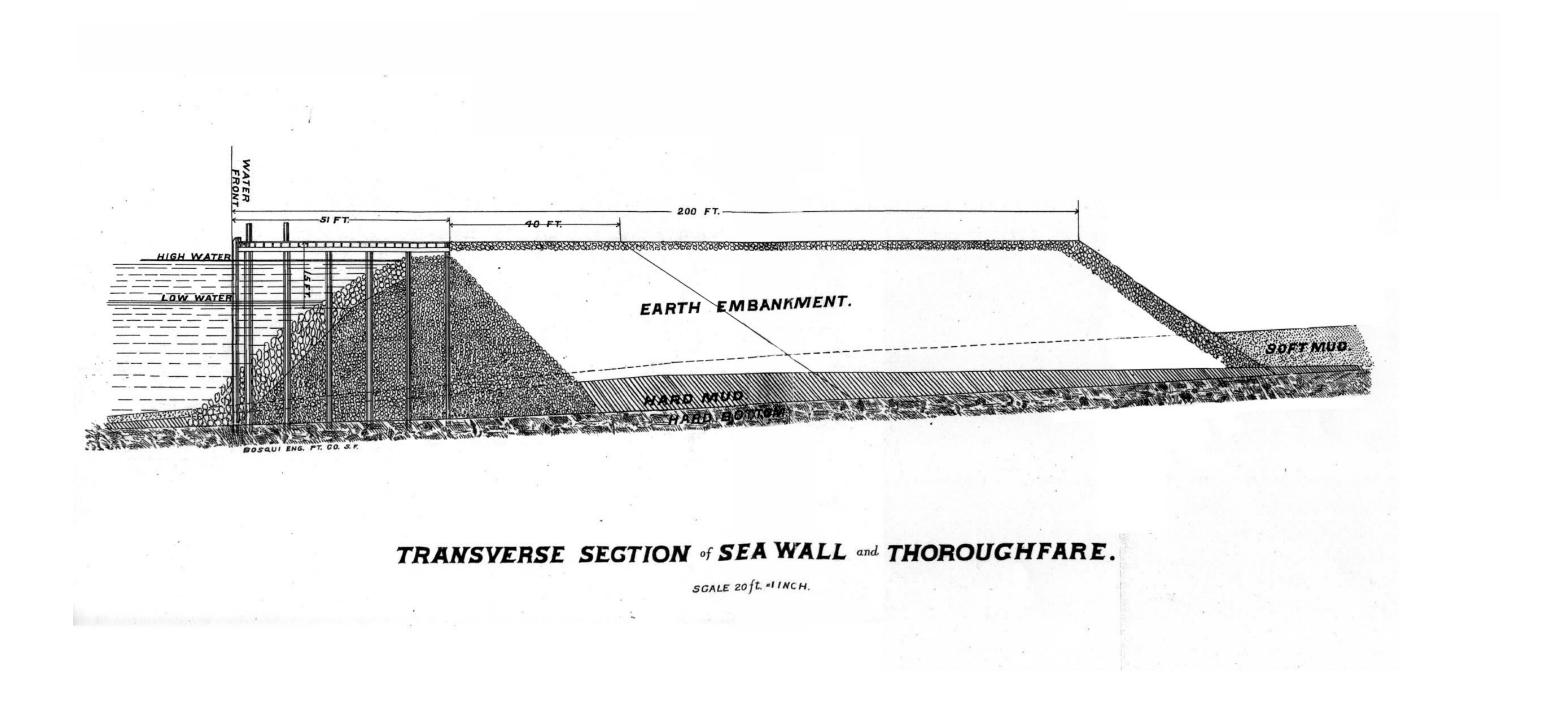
Original design of seawall, construction begun 1878. T.J. Arnold, Engineer of Seawall. Source: Crane 1882:n.p.
